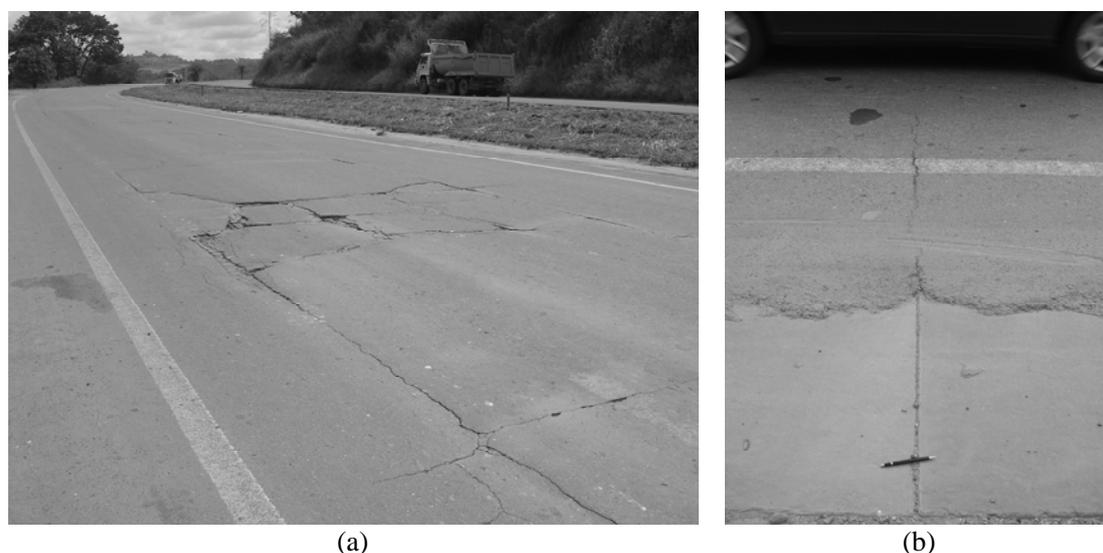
Joints and cracks of the concrete slabs propagated to the surface (December 2012)
